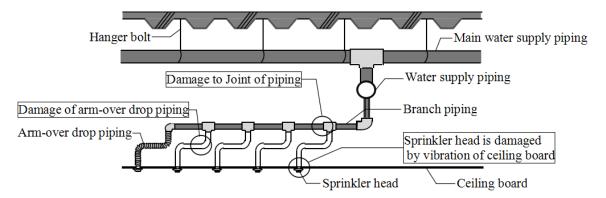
Damage case of fire sprinkler system ¹⁾
